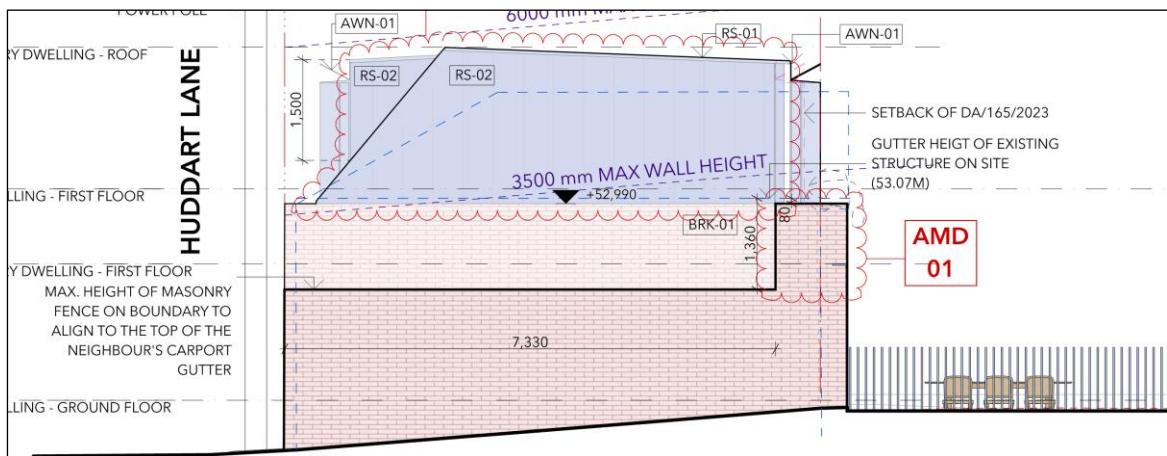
Proposed North East Elevation – DA/165/2023/B
